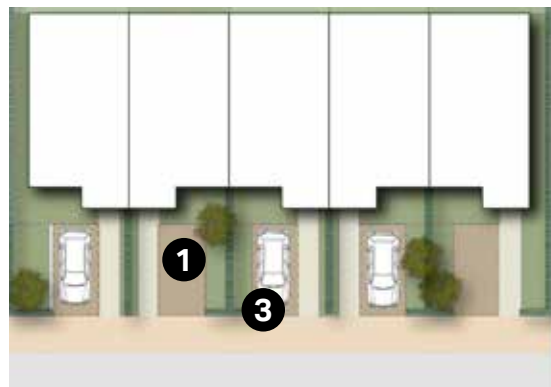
Illustrative diagram showing an indicative layout of on-plot front parking.
